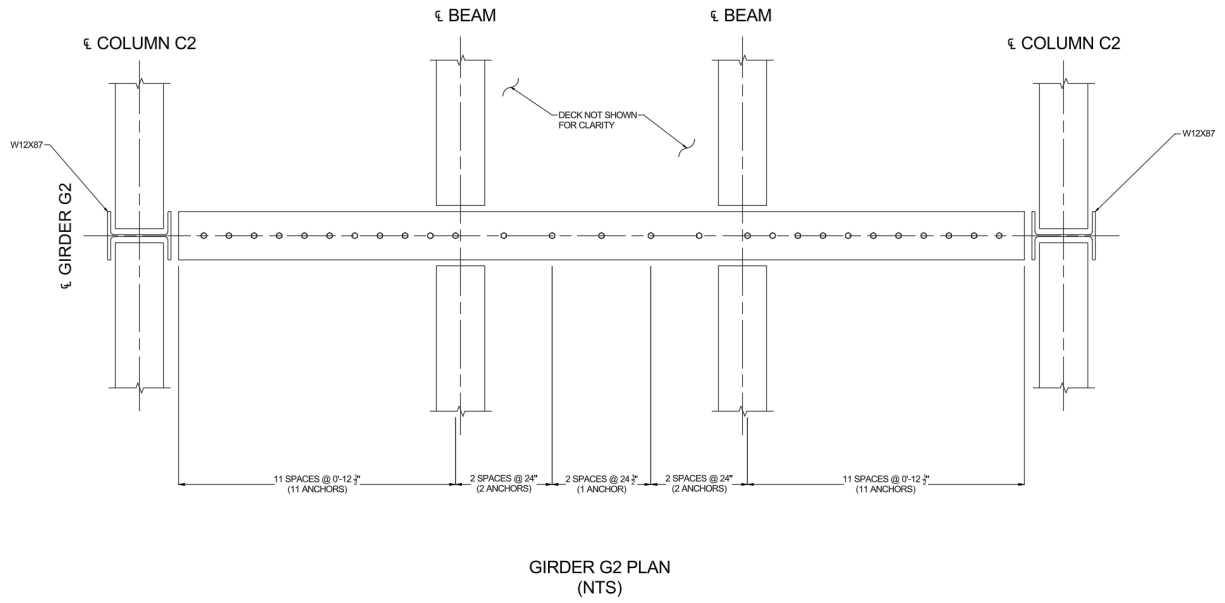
Girder G2 Steel Headed Stud Anchor Layout
